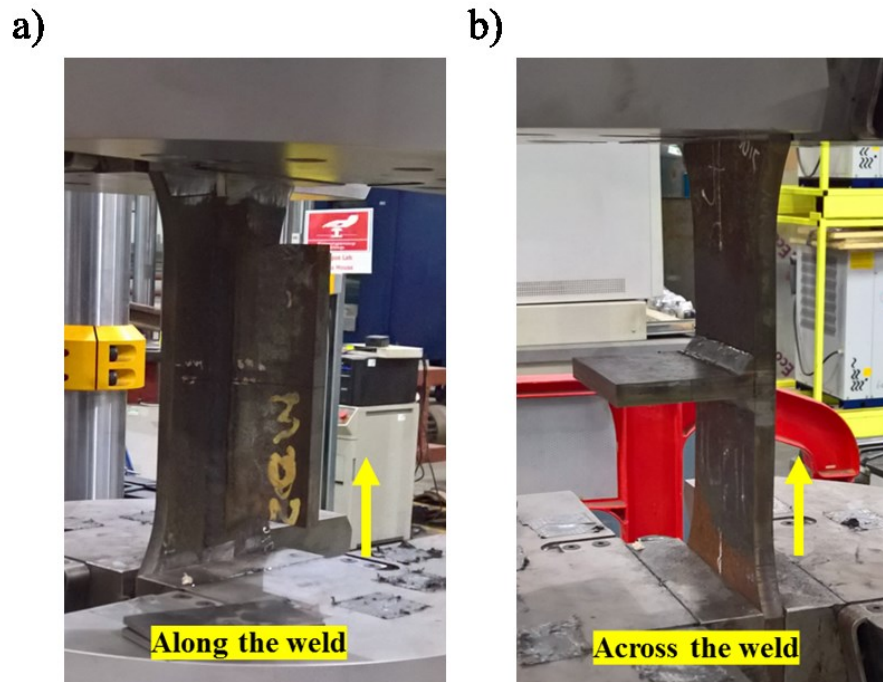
Photograph of the set-up used for the cyclic loading of fillet welded plates: a) Fillet welded plate with the long weld and, b) fillet welded plate with the short weld.
